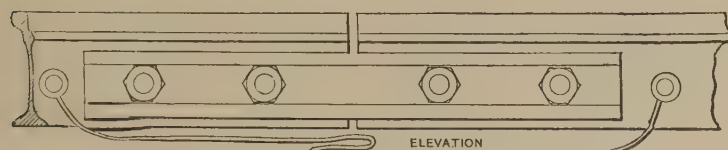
RAIL BOND WITH GIRDER RAIL.
